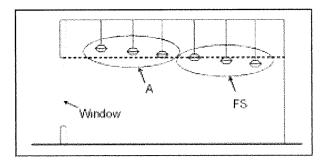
Elevation view showing a nonresidential application of indoor lighting, labeled FS, which will be subject to this Article and indoor lighting, labeled A, which is installed so that it is not subject to this Article. This example presumes the structure in question is not elevated such that any of the luminaries labeled A in the figure above may be seen from any other property. If the structure is elevated such that the luminaries labeled A are visible from another property, then they are subject to this Article.
